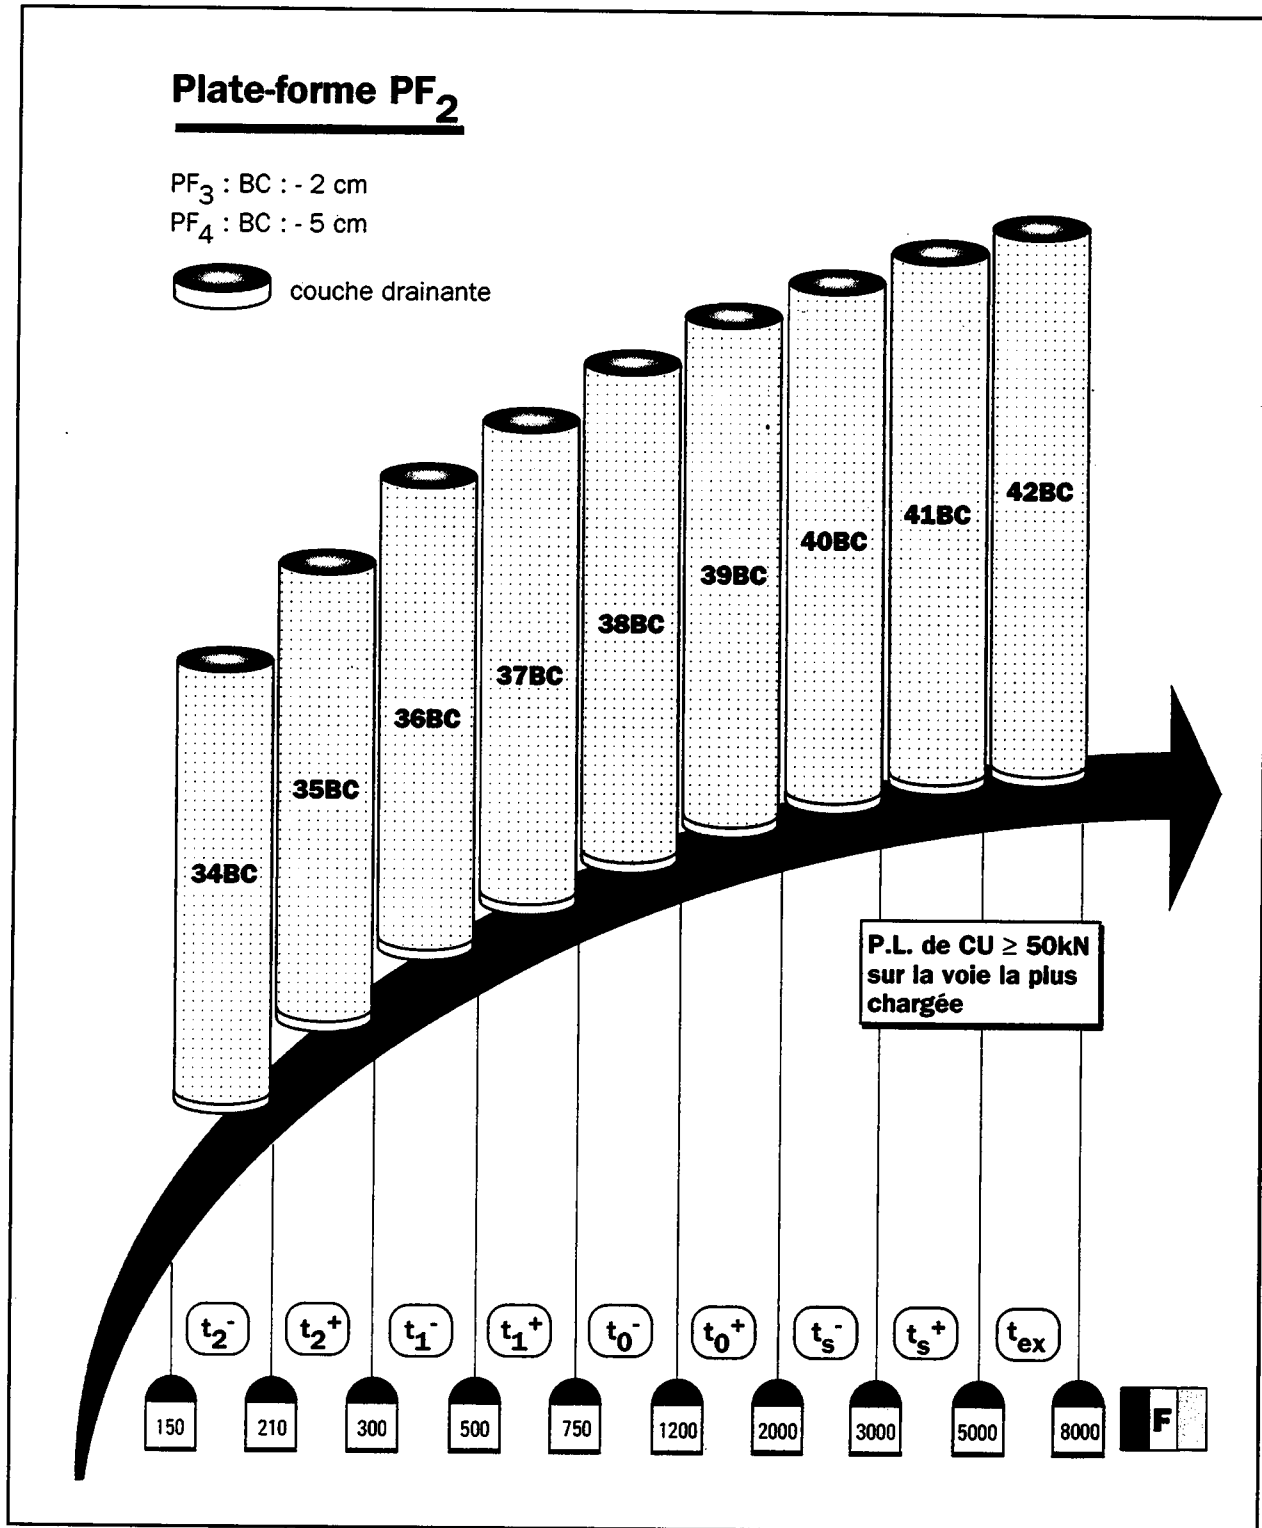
Example of a Design Catalogue for a Jointed Plain Concrete Pavement. ³⁹
